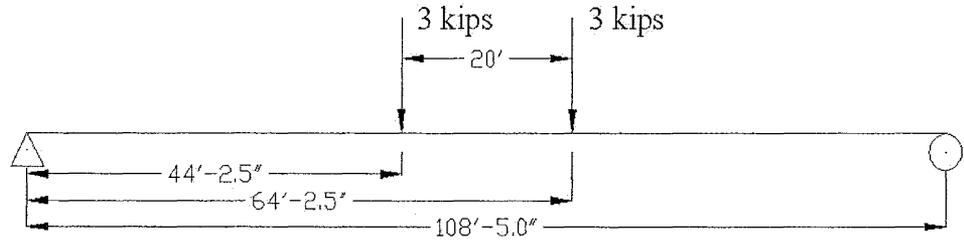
Location of interior diaphragms on a simply supported bridge girder.
